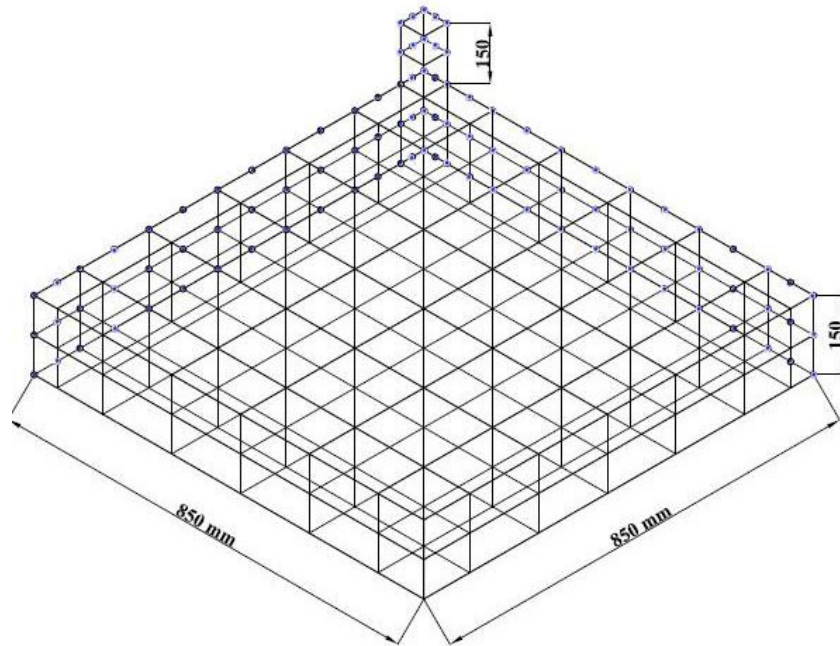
Geometry, boundary conditions, loading arrangement and reinforcement details of slab HS1
